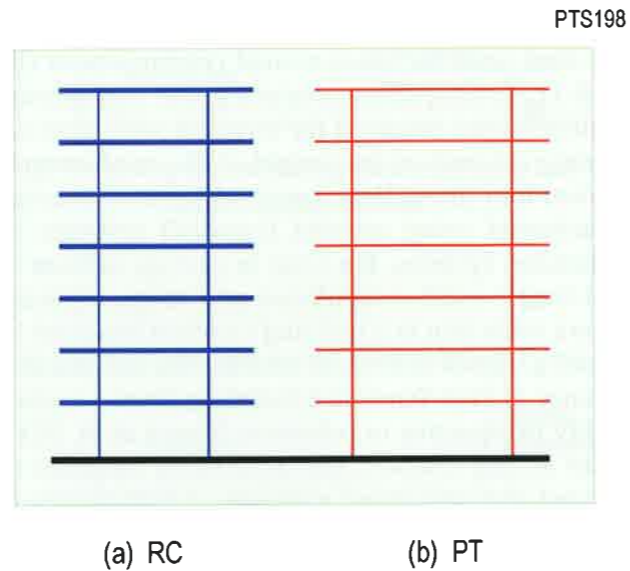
D-1 Conventionally Reinforced and Post-Tensioned Concrete Frames—Span and Thickness Comparison
